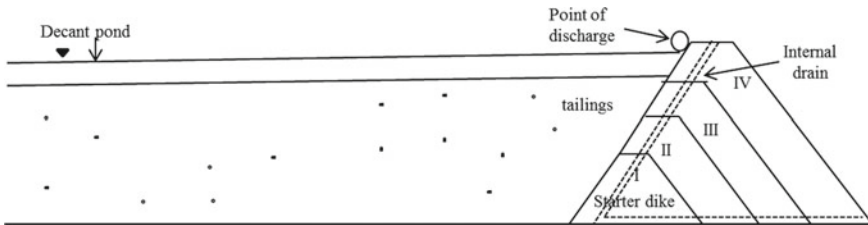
D/S method of tailings dam construction (recreated after [12])
